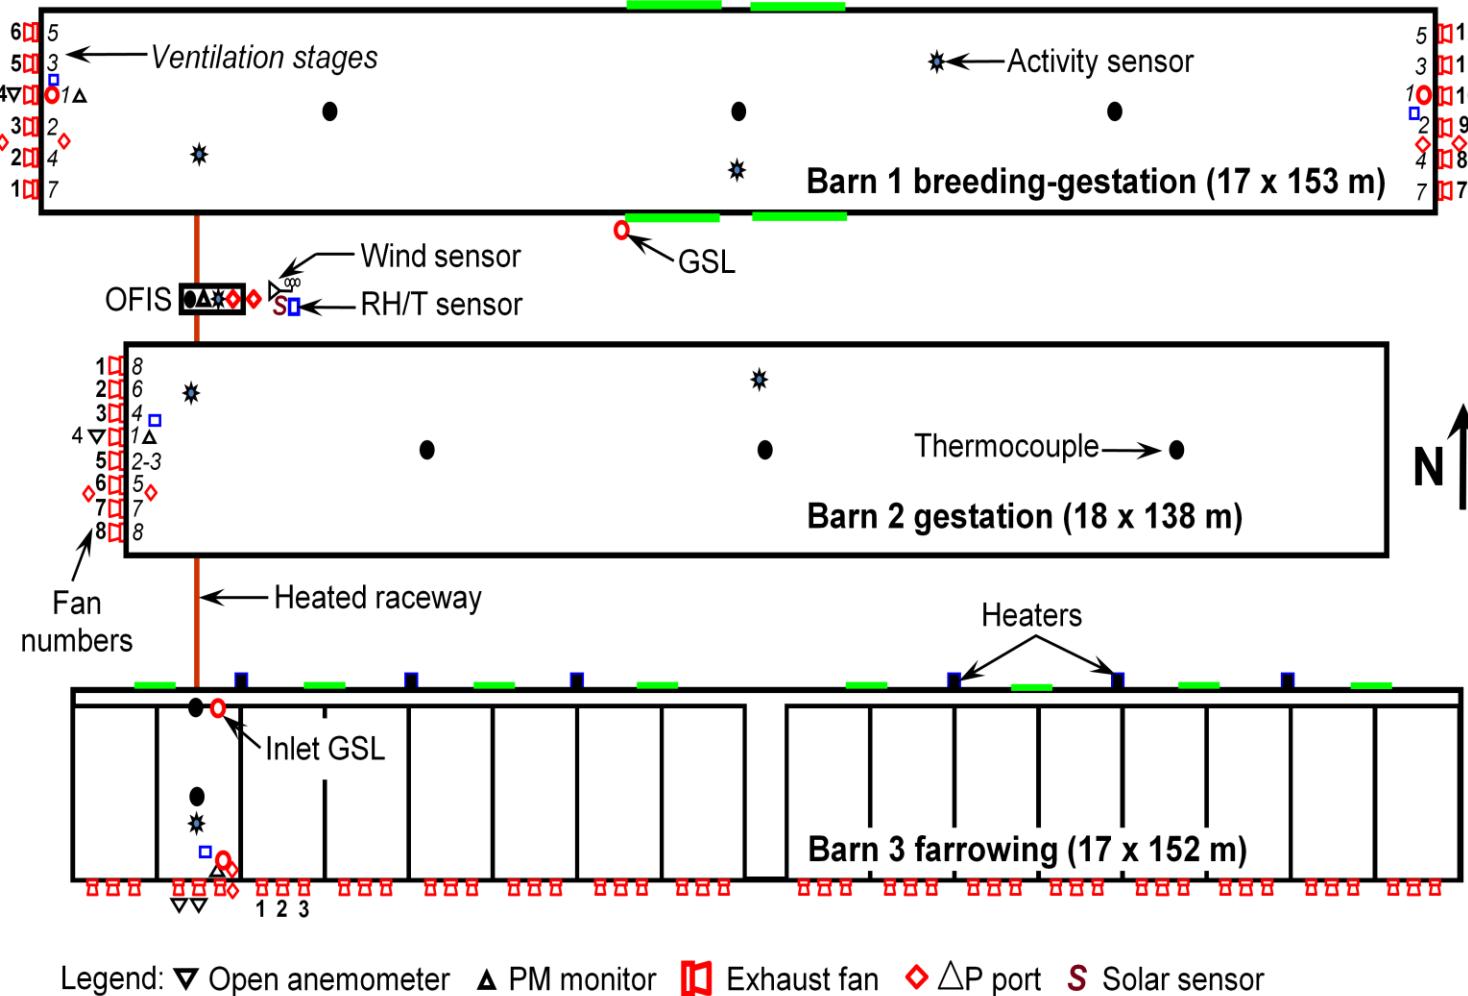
Floor plan of the barns, showing the sampling and measurement locations.
